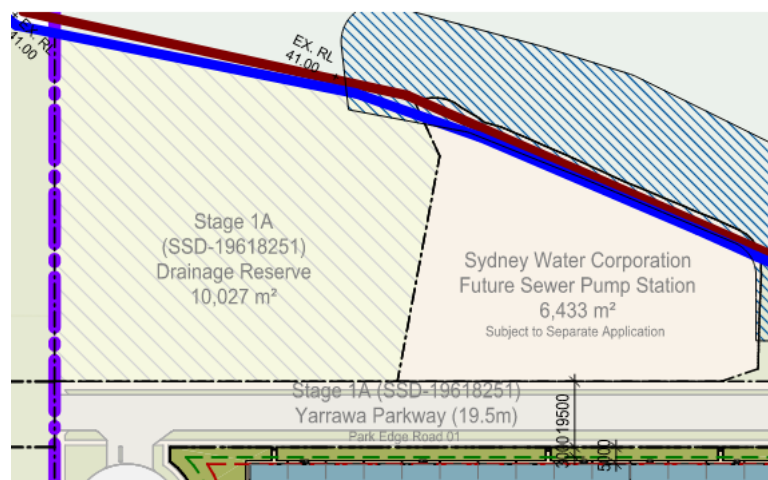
Drainage Reserve within the SSDA Masterplan Stage 1B Drawing (Source: SBA Architects)
